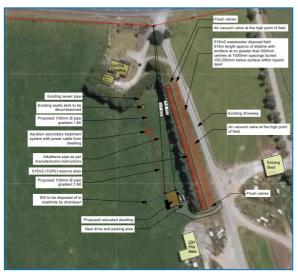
Onsite wastewater layout for dwellings on Lot 1 (Source: Far North District Property File EBC-2022-1491 Approved Stamped Plans, Site Plan Extract)
